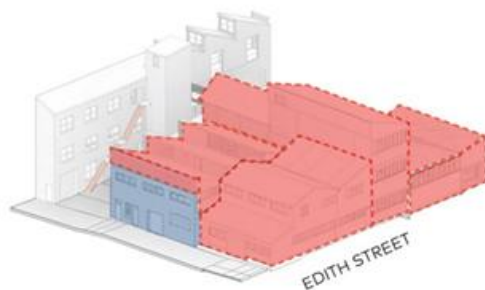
shows a comparison of the DCP prescribed fabric retention, approved demolition, additionally proposed demolition and reconstruction of Building 7.
